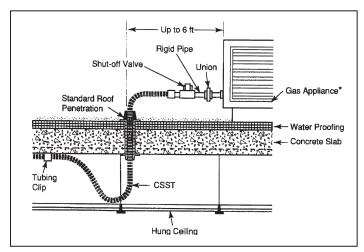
Short (1-6 foot) outdoor connection to roof mounted equipment
